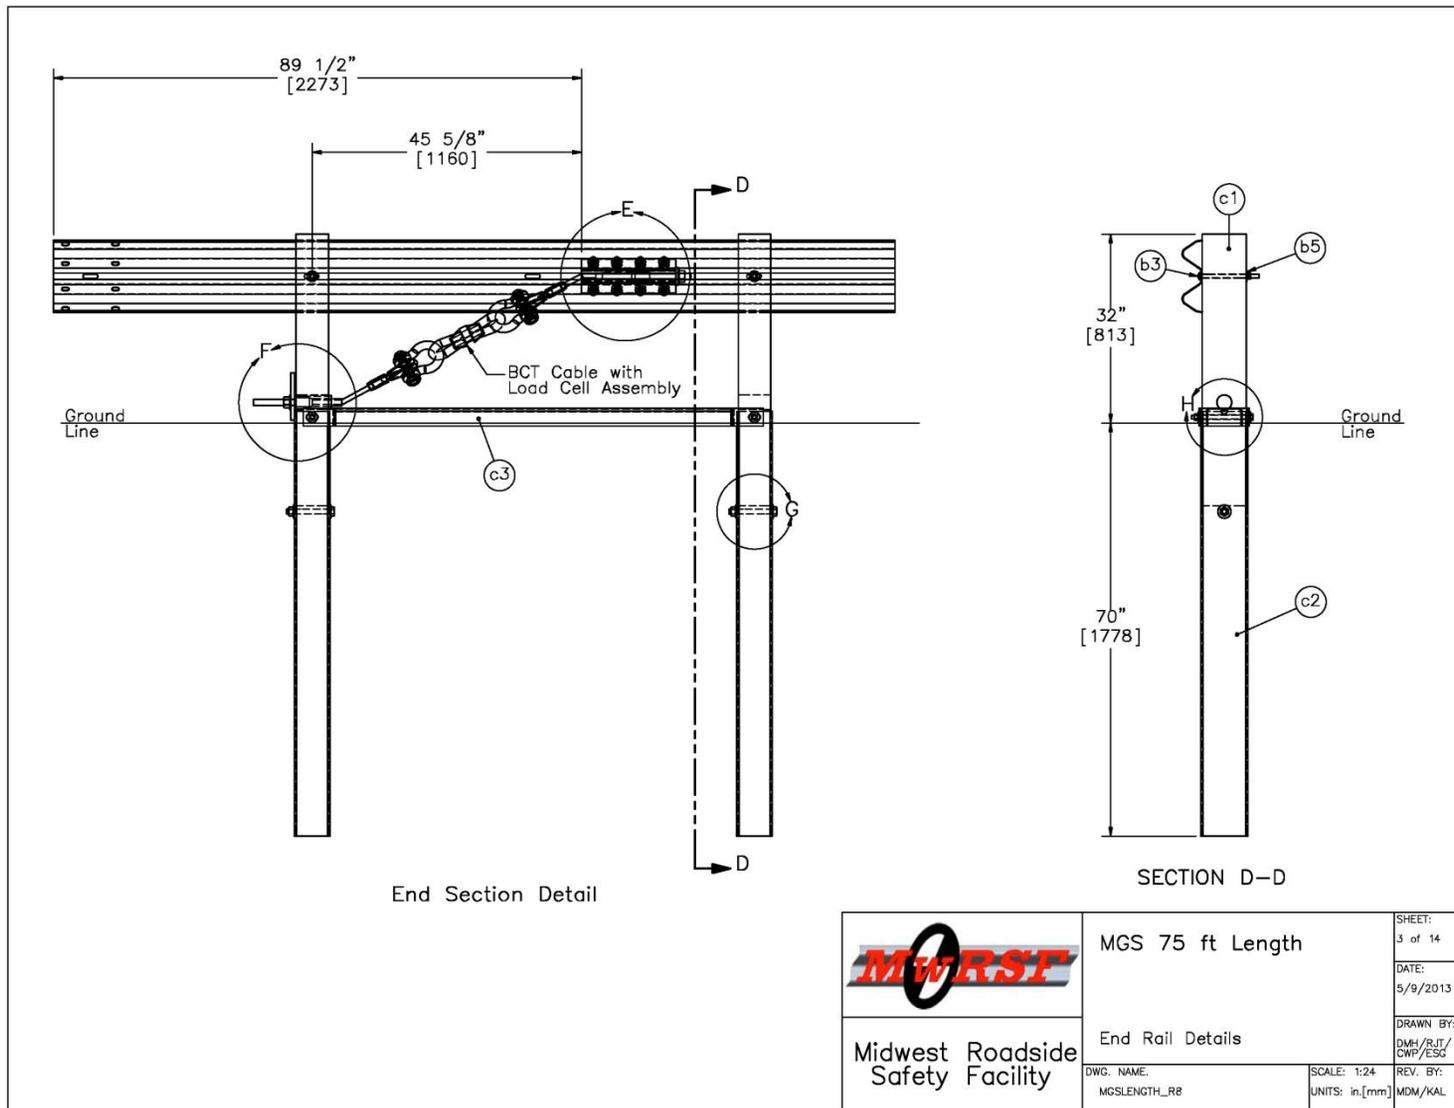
BCT End Anchor Details, Test No. MGSMIN-1
